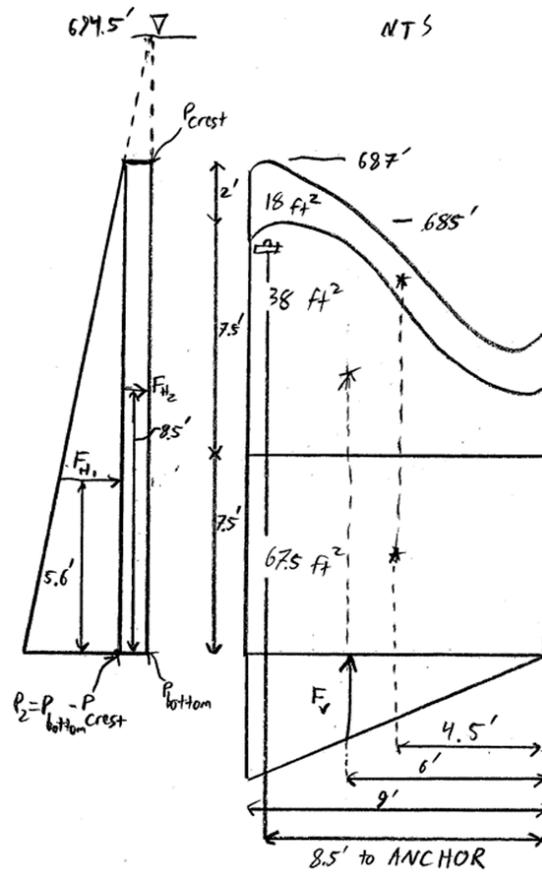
represents the case for a 2-foot concrete raise at the new full pool elevation of 687'. The forces contributing to overturning are the horizontal hydrostatic force acting on the upstream side of the crest, and the vertical hydrostatic forces from the water assumed to be creating an uplift pressure on the bottom of the spillway. The restoring forces are the weight of the three defined concrete sections, the main ogee, its rectangular base, and the new concrete placed on top. The net moment is negative, which is defined as the counterclockwise, restoring direction. This means the weight of the crest alone is enough to prevent overturning at full pool, with a calculated safety factor of 1.15.
